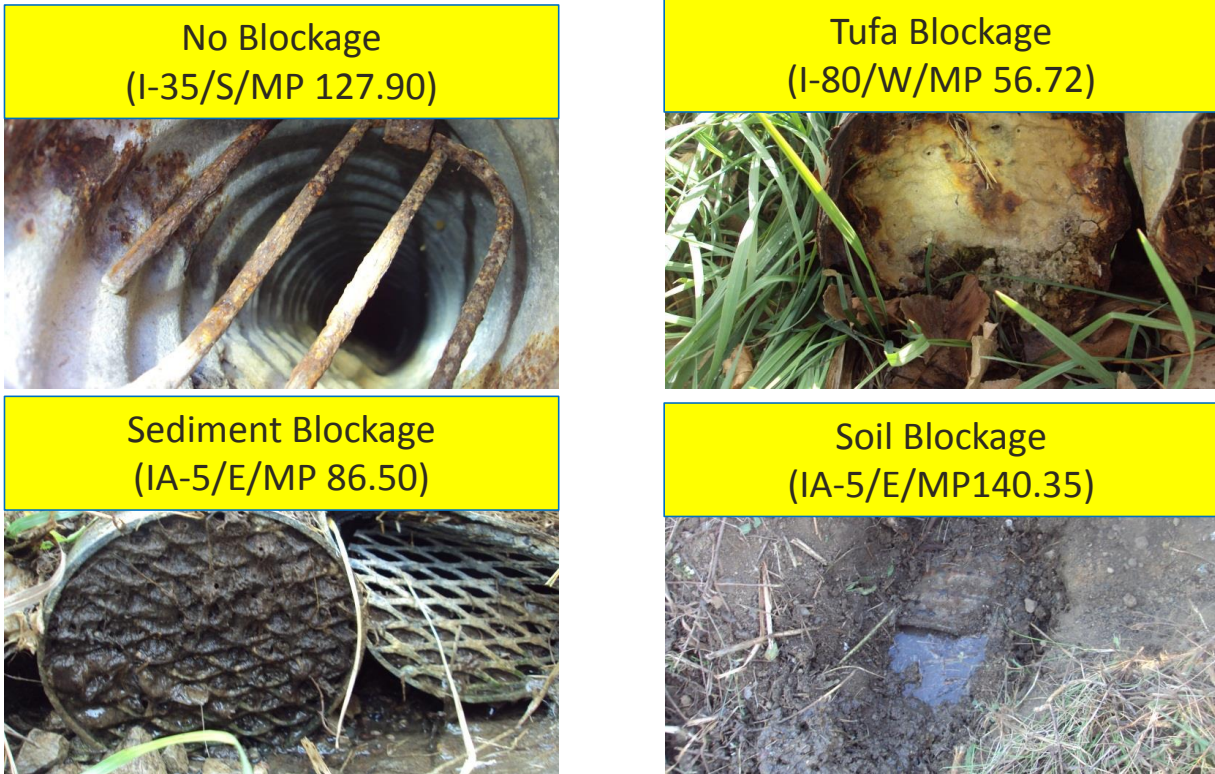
Typical roadway subsurface drainage outlet conditions in Iowa
